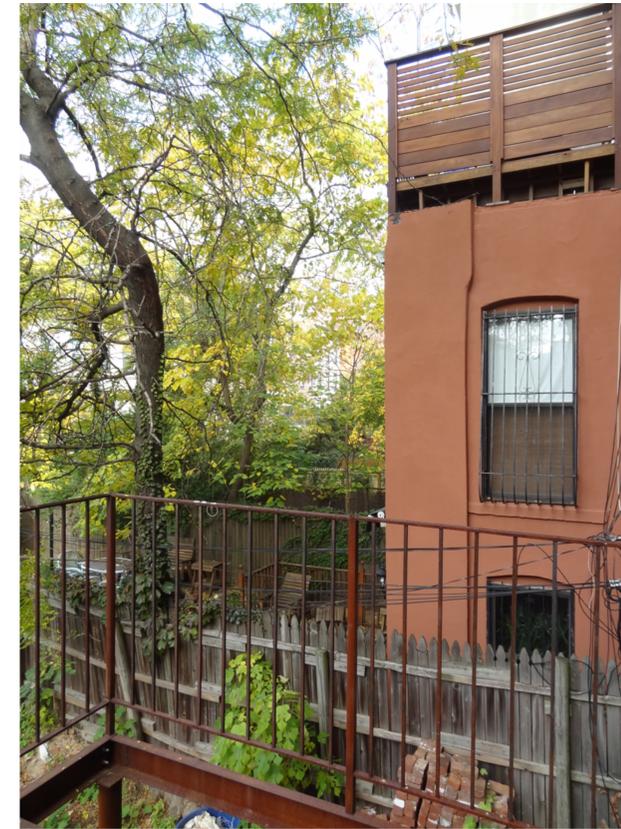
DETAIL OF EXISTING REAR WEST FAÇADE W/ 2 STORY ADDITION AT 46 DOWNING ST.
